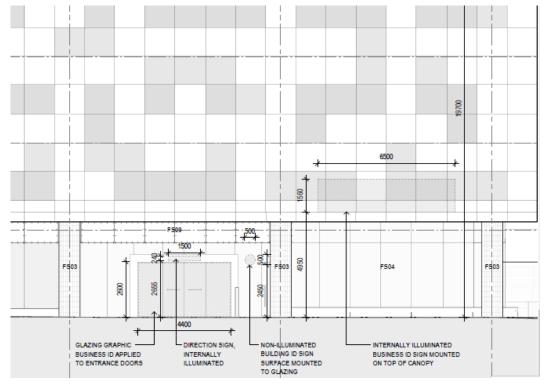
Sign 3, Sign 4 & 5, Sign 6 across the southern elevation (Right to Left) Source: DCM
